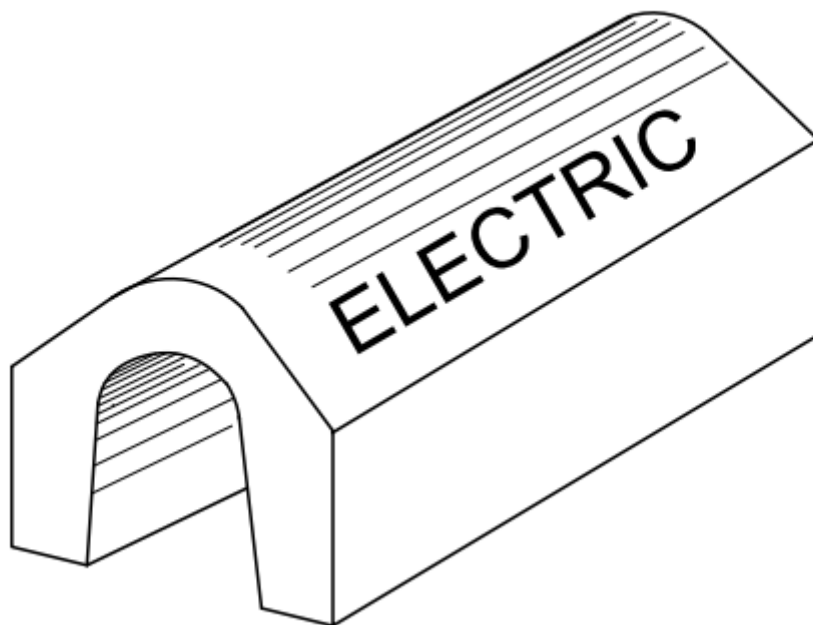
TYPICAL UNREINFORCED PRECAST CONCRETE CABLE COVER ARCH TOP
